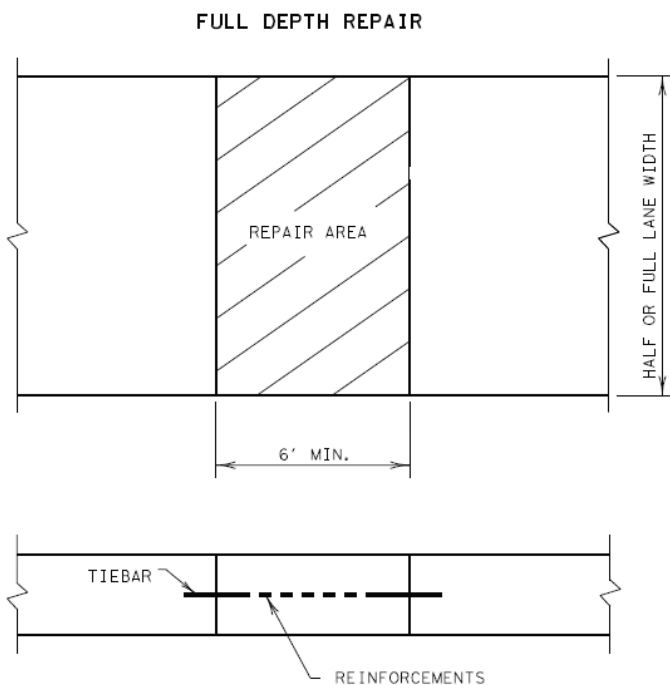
Plan and cross section of the Texas FDR of CRC pavements.
